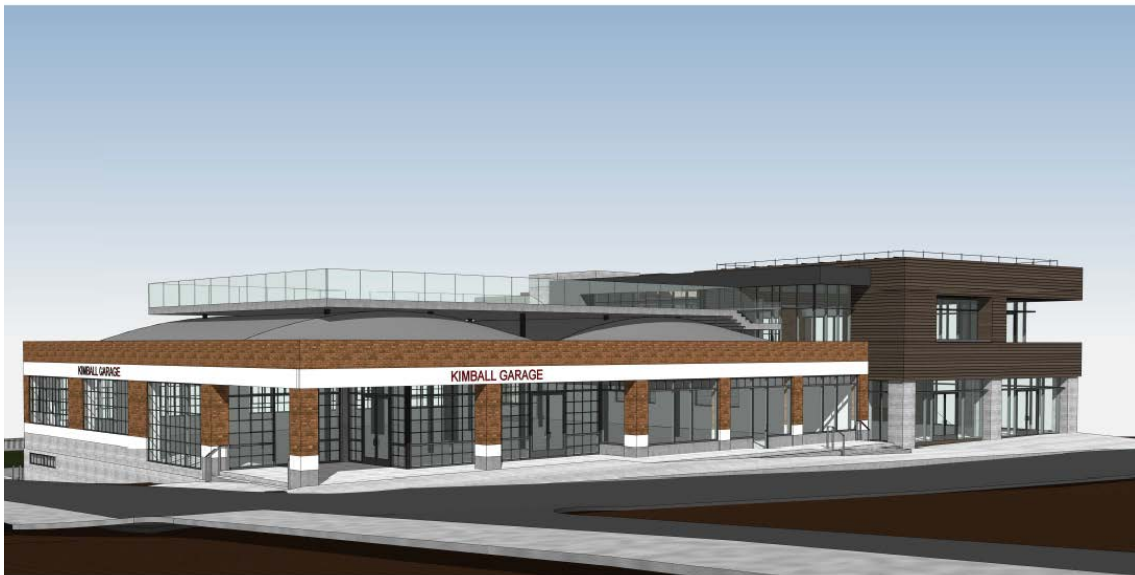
The south elevation shows the relationship of the historic building, proposed rooftop deck, and the new addition. Note that the eastern barrel-vault is removed and the deck sits below the parapet of the historic building. Had the deck been cantilevered over the barrel-vault, the deck would have been significantly higher than the parapet.
